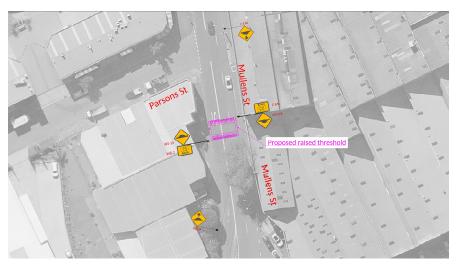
Mullens Street between Robert Street and Parsons Street proposal.
